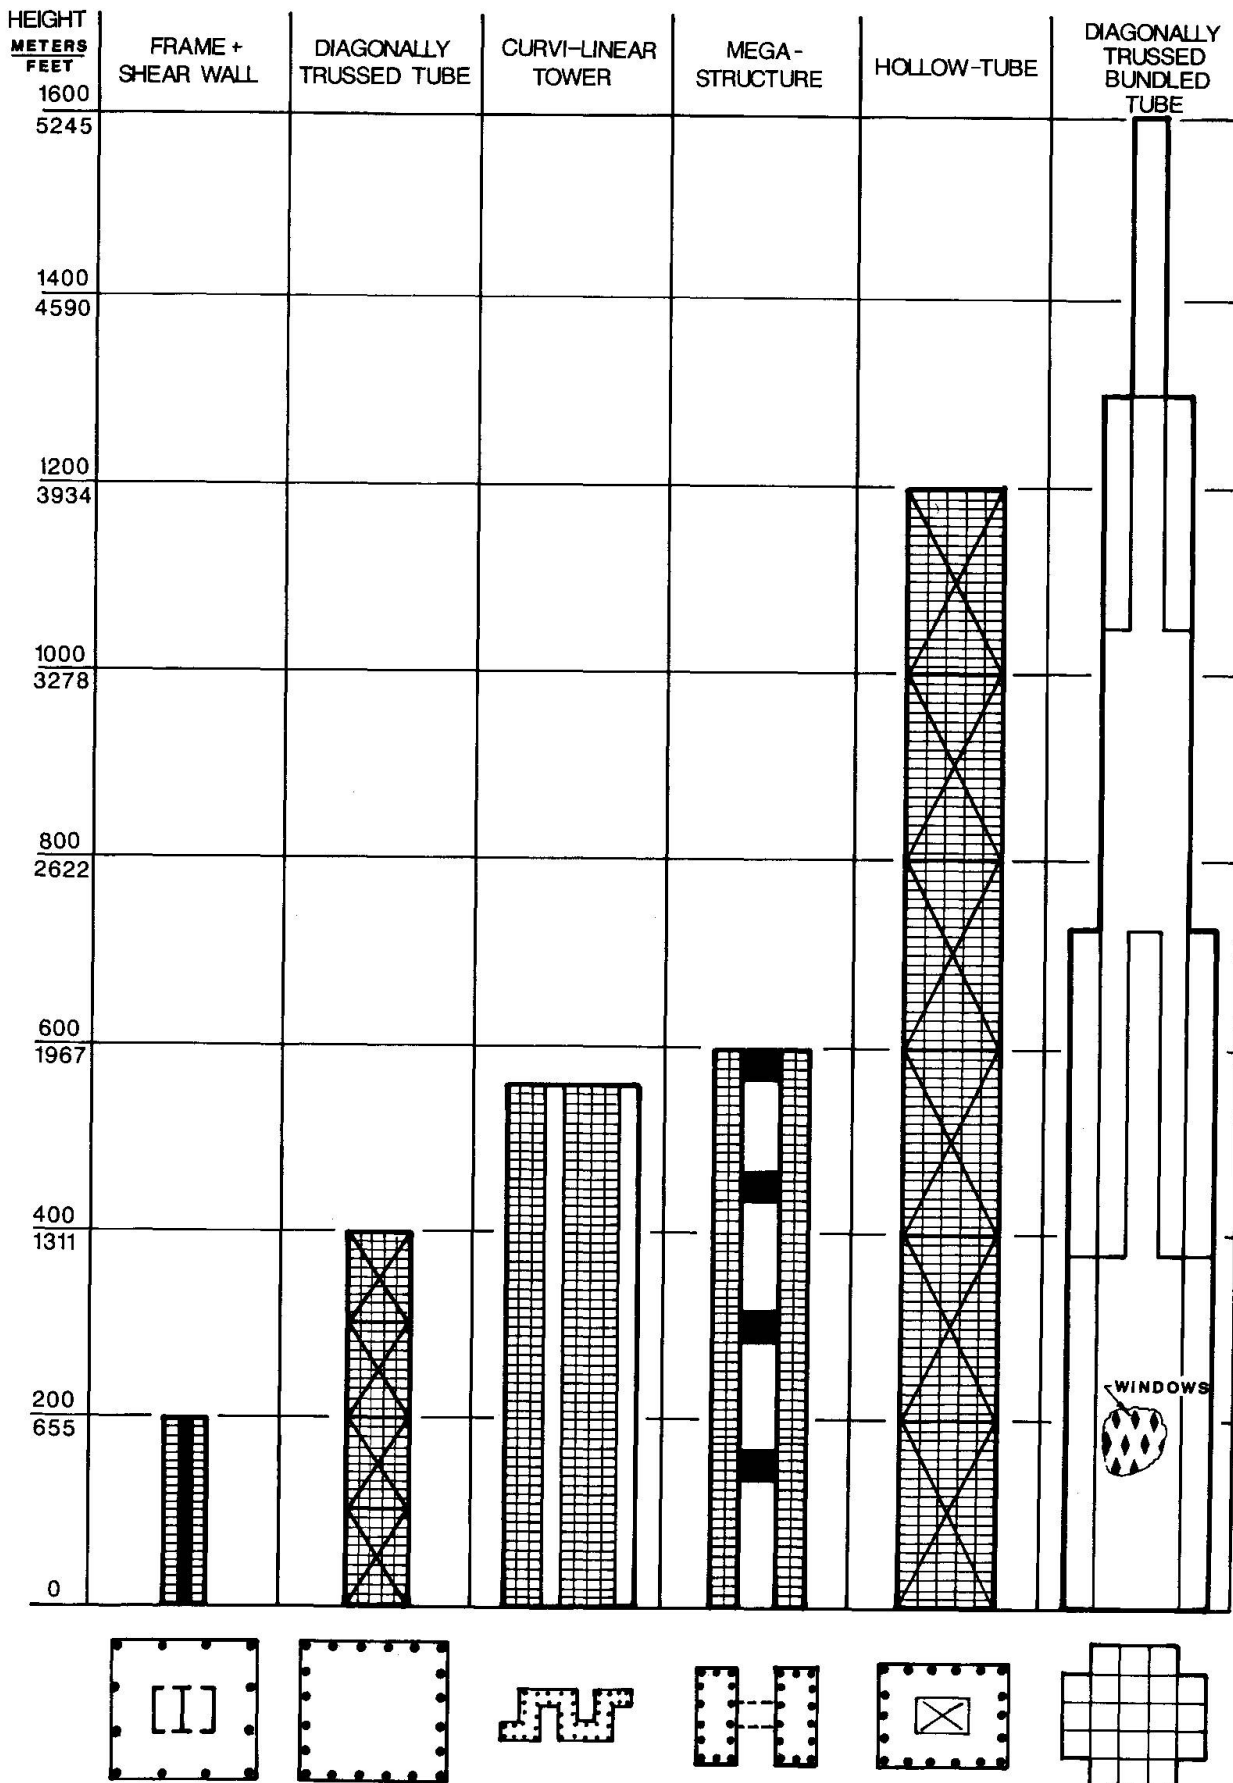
OPTIMUM STRUCTURAL SYSTEMS IN CONCRETE
